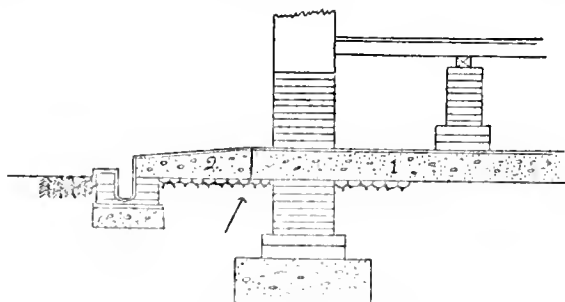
Detail of termite-proof construction: a layer of cement at ground level laid in two parts.
